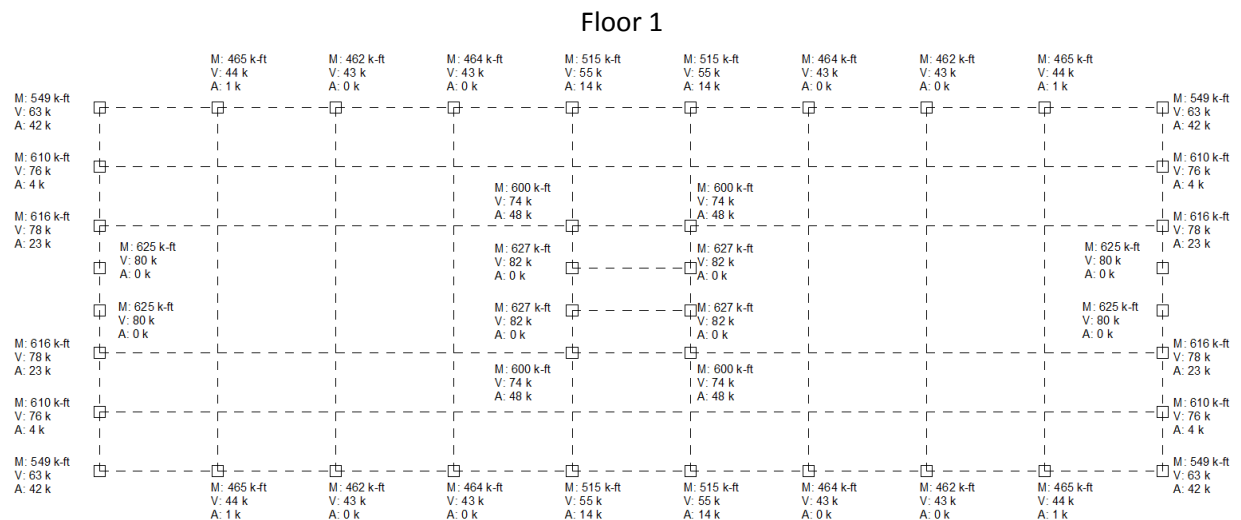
Maximum forces in the first floor columns due to tsunami base shear
